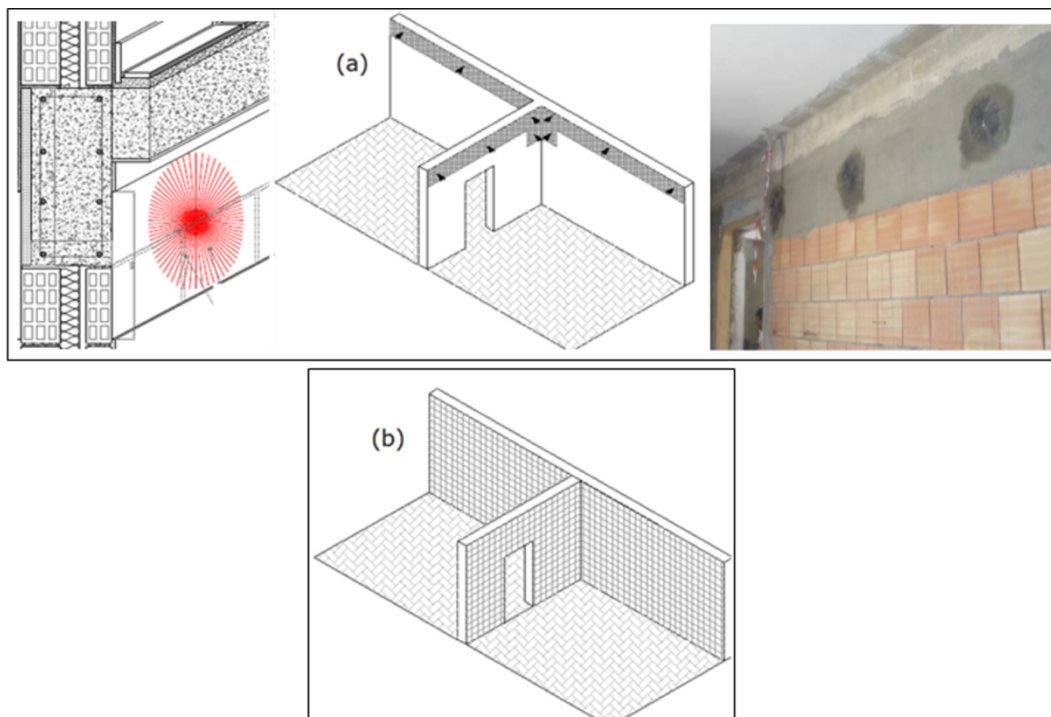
Scheme of the boundary connection of infill panels to the surrounding RC frame: application of a steel wire meshes and tassels (a); reinforced plaster (b).
